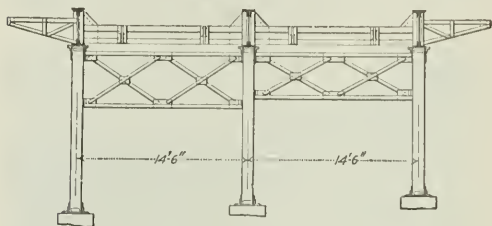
SECTION THROUGH STEEL BRIDGE REPLACED AT MILLBURN, N. J.
